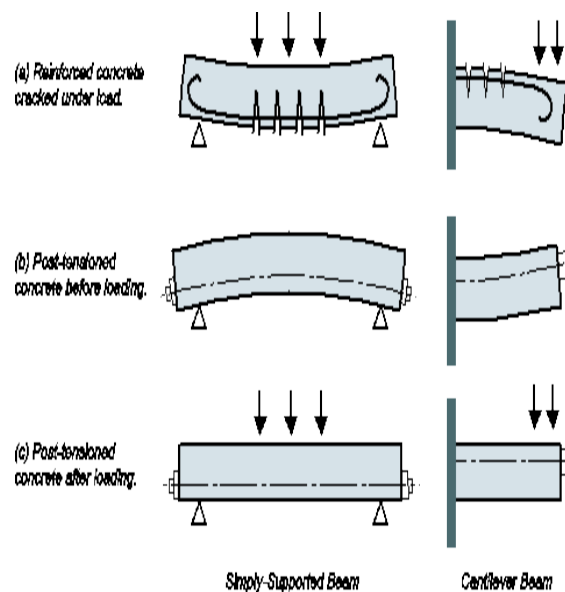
Comparison of Reinforced and Prestressed Concrete Beams
